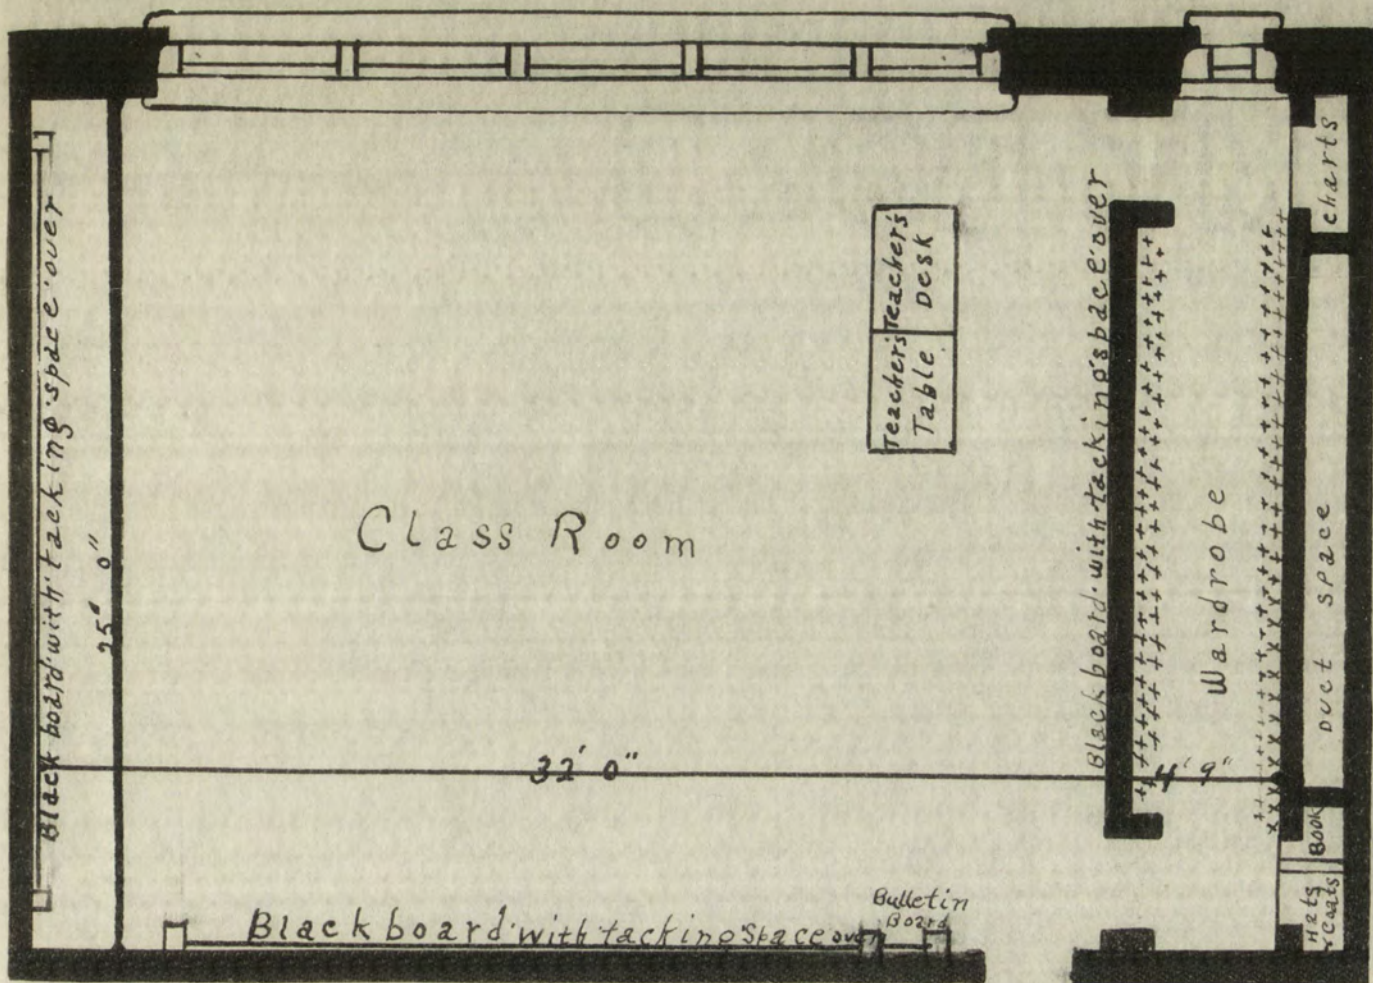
Plan Devised by a Cleveland Architect for the Schools of that City. (Suggested Plan for Future Classrooms of Belen Schools.)
